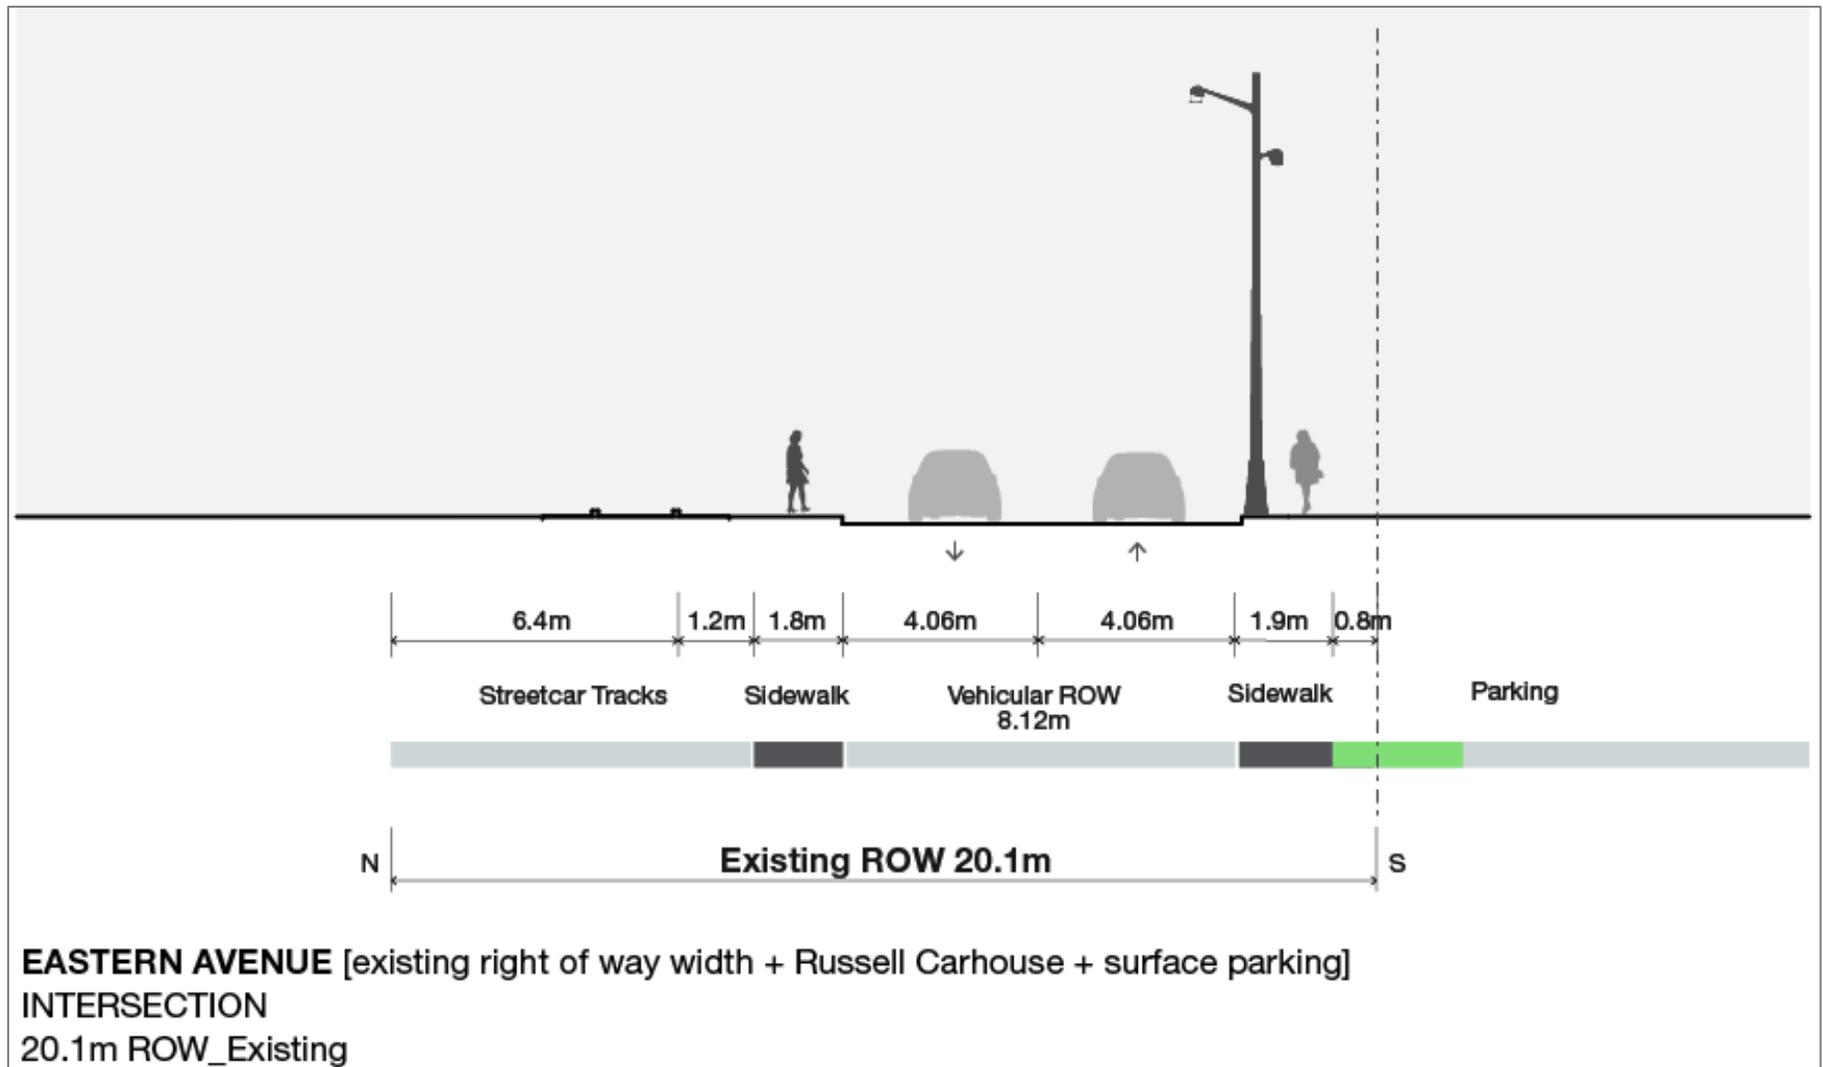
CROSS-SECTION – EXISTING EASTERN AVENUE, EAST OF LESLIE STREET (RUSSELL CARHOUSE)
